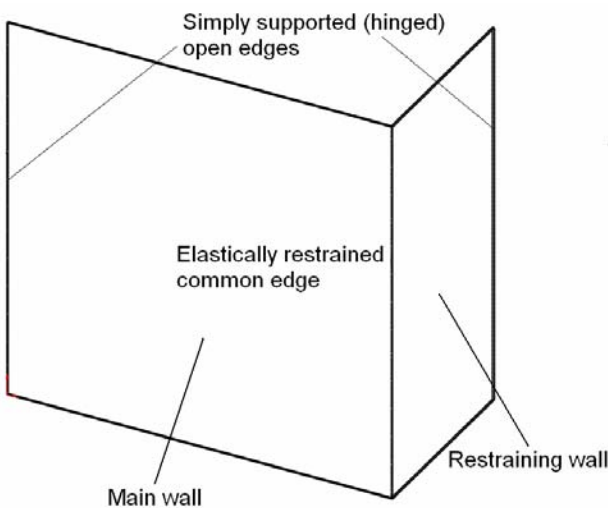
Schematic representation of the angle section with illustration of main wall and restraining wall
